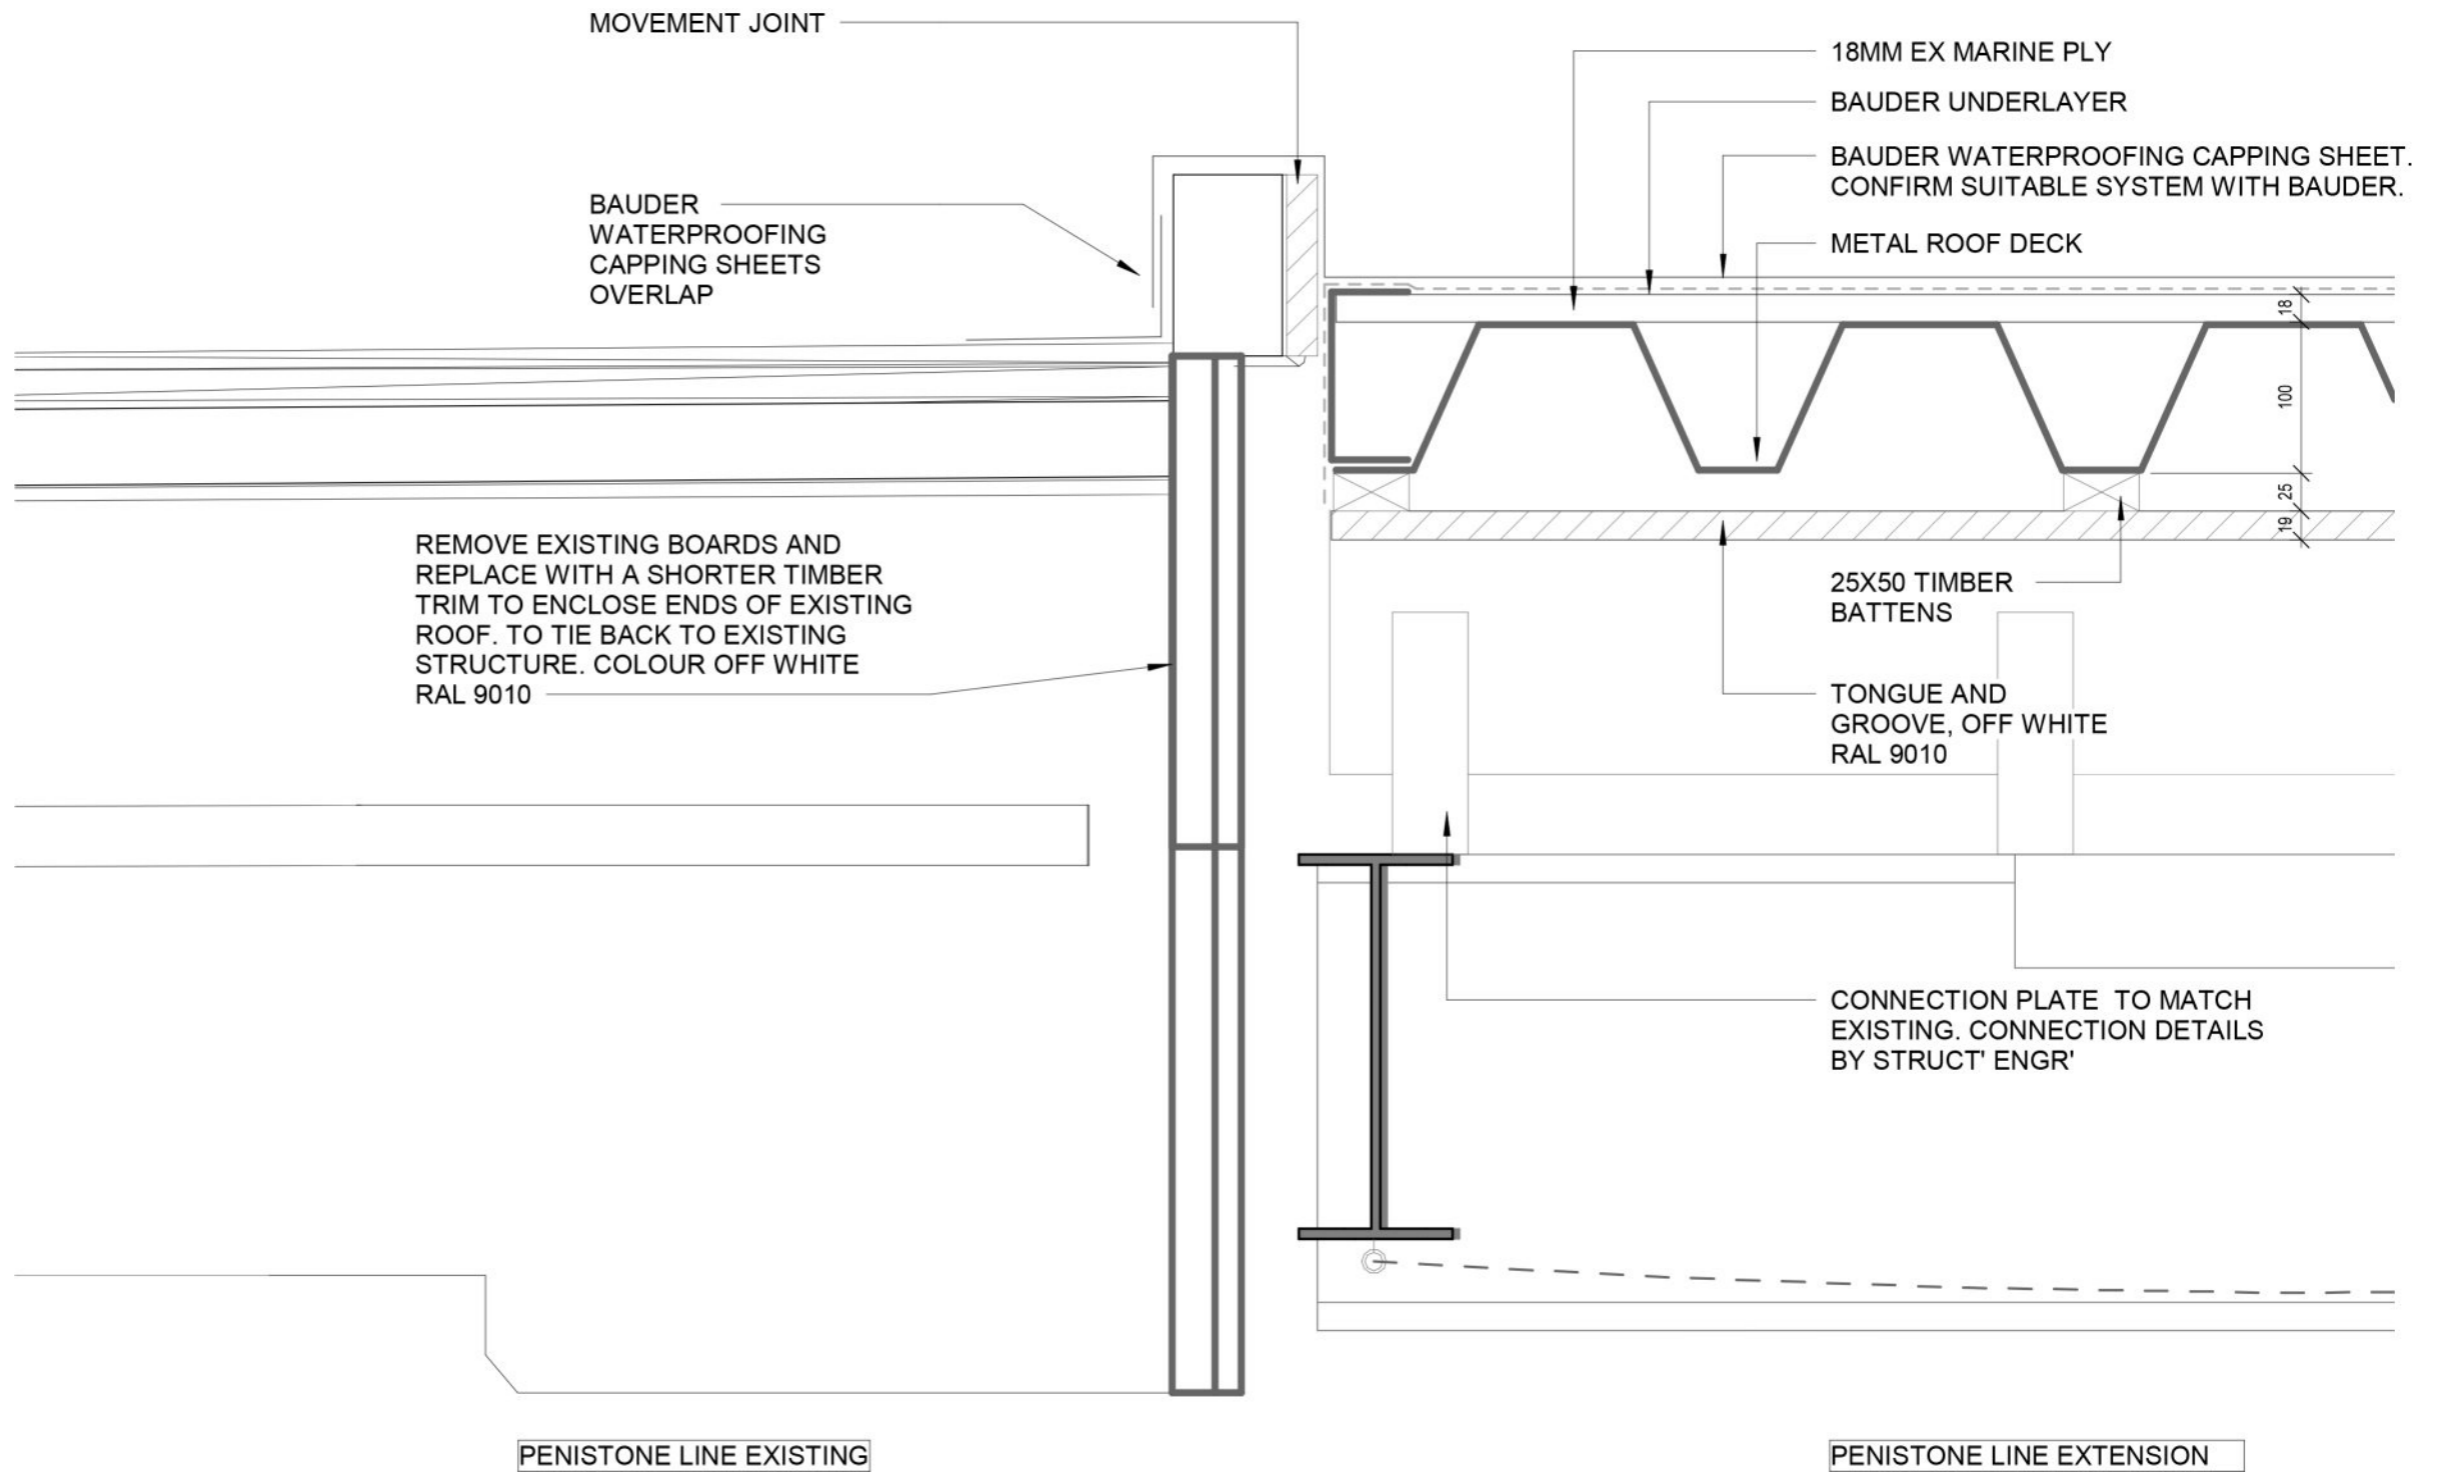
Section detail the Penistone Line proposed and existing interface
